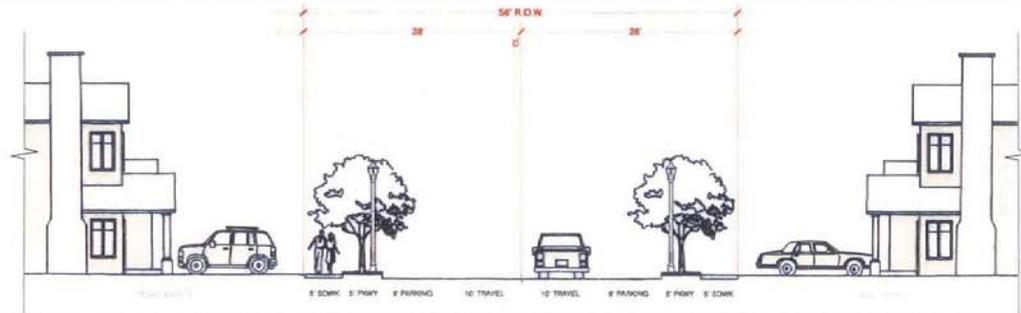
DETAIL STREET TYPE STREETScape LANDSCAPE STANDARDS STREET SECTION
